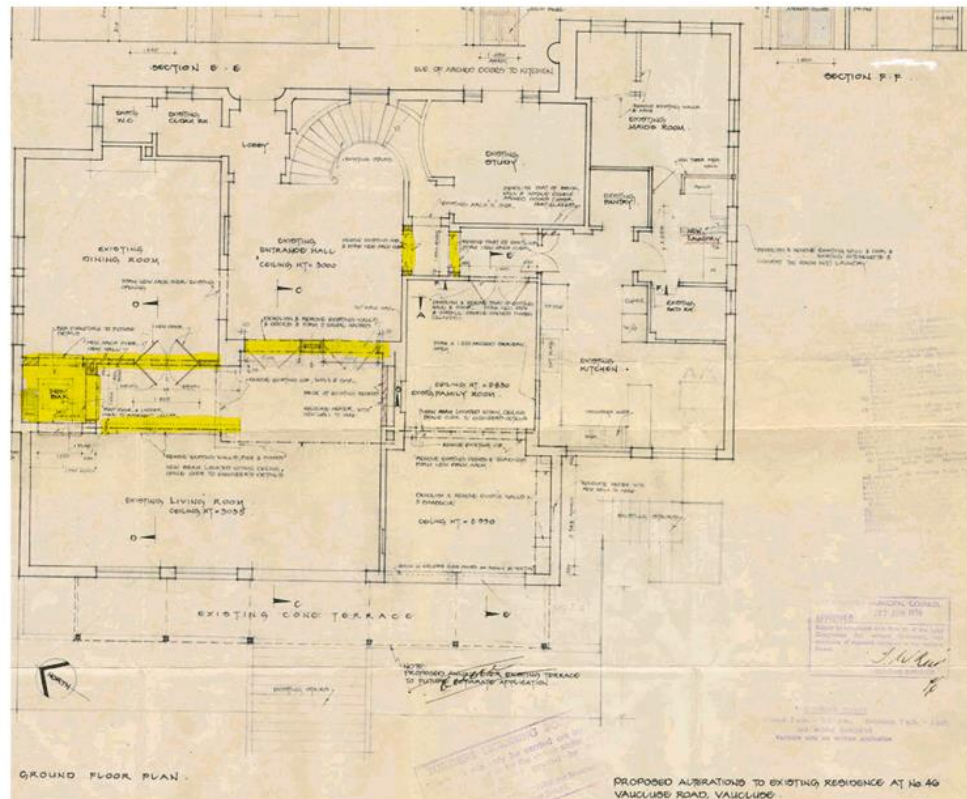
Kubany scheme ground floor plan, with works not carried out shown highlighted.
